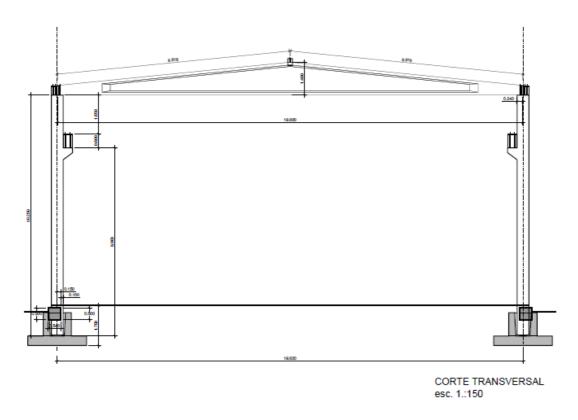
PORTICO CROSS SECTION OF INDUSTRIAL PAVILION.
